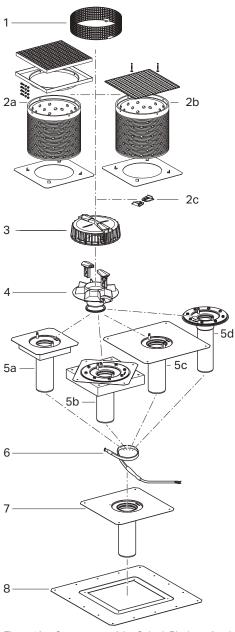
Components of the Geberit Pluvia roof outlets 25 I
